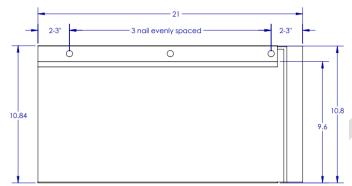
View of TimberSteel™ Metal Roof Shingle (half-shingle)
